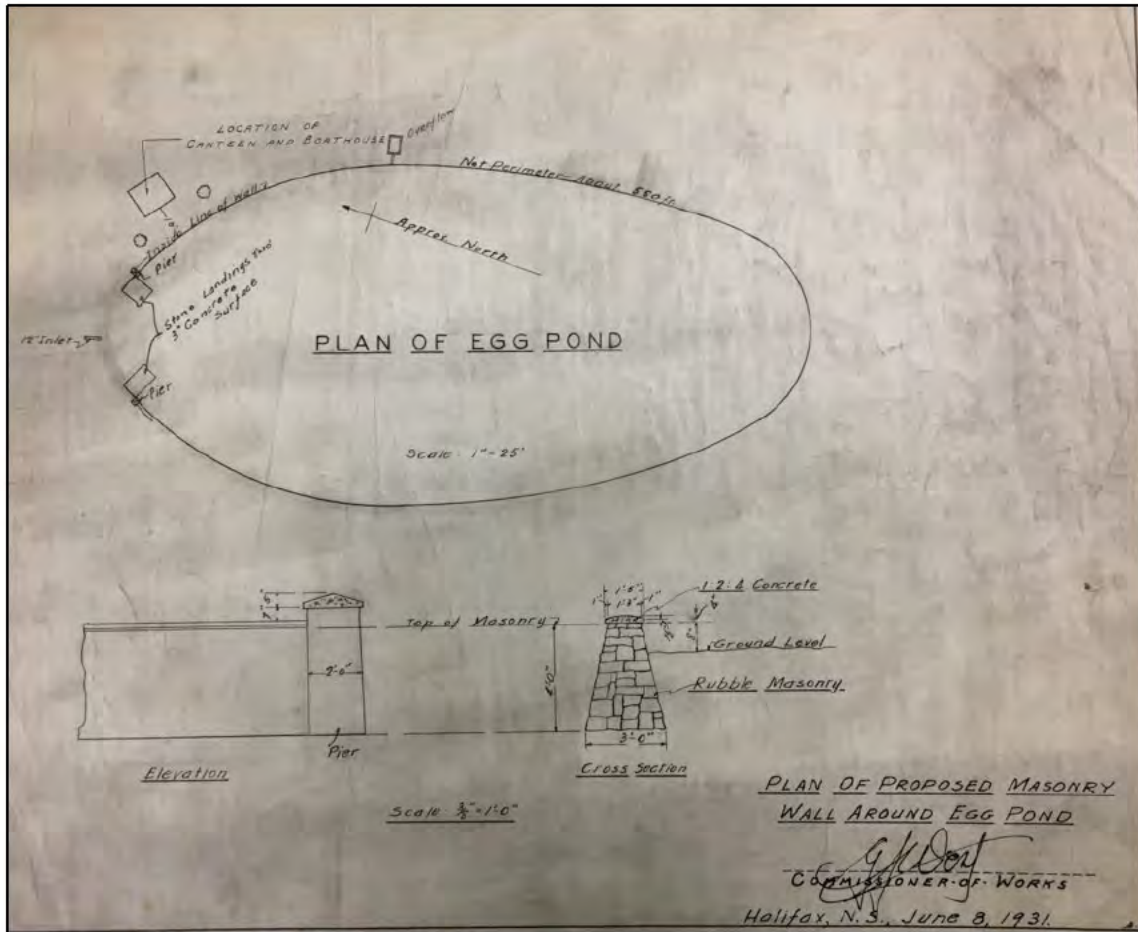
A plan of a proposed masonry wall around Egg Pond, 1931.<sup>322</sup> The location of the boathouse and canteen appears to have been a later addition.
